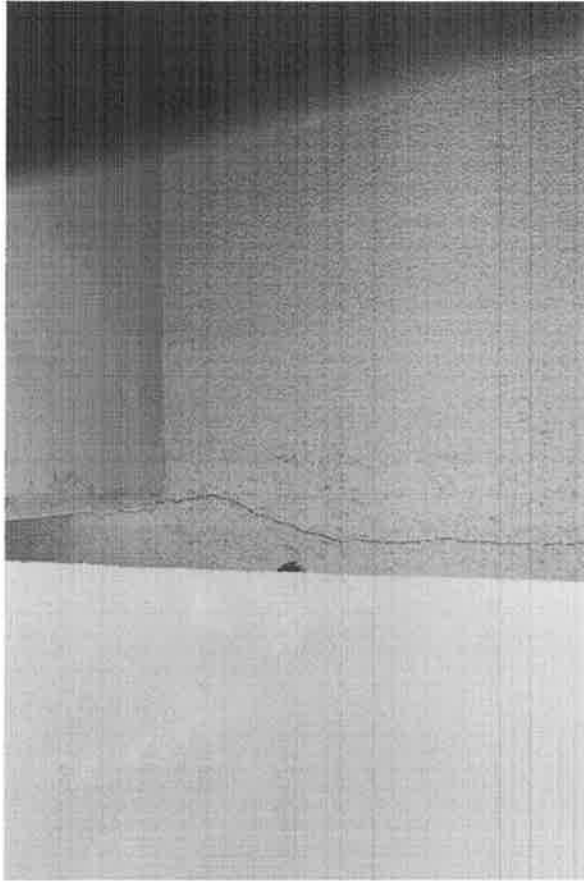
Hairline crack in area of previously repaired CMU wall at unit 1101 (typical)
